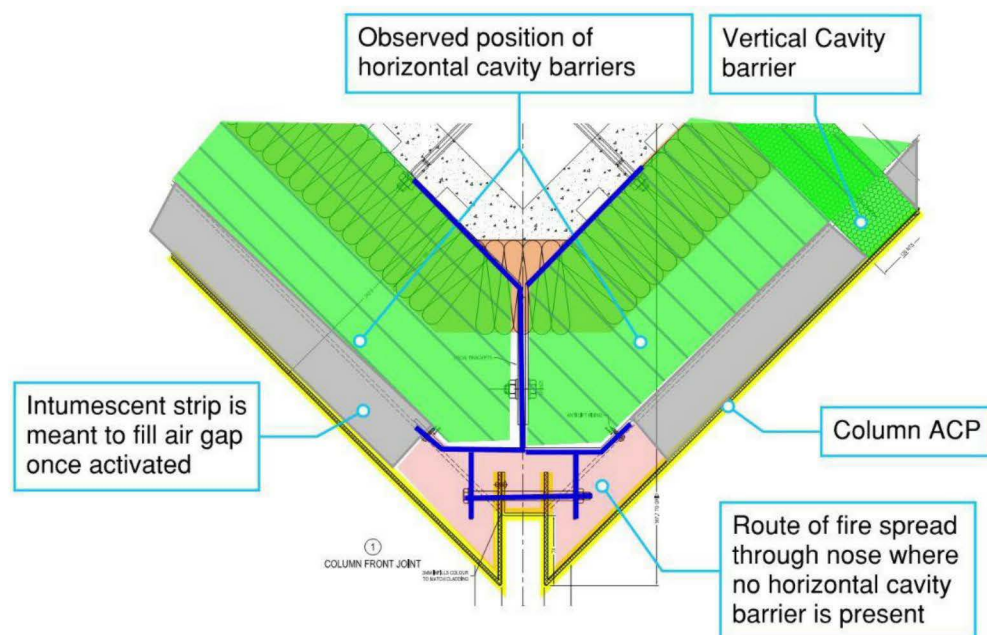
Harley design drawing showing column in plan view showing a gap where the horizontal cavity barrier was not present at the nose of the columns (Based on HAR00008902)
